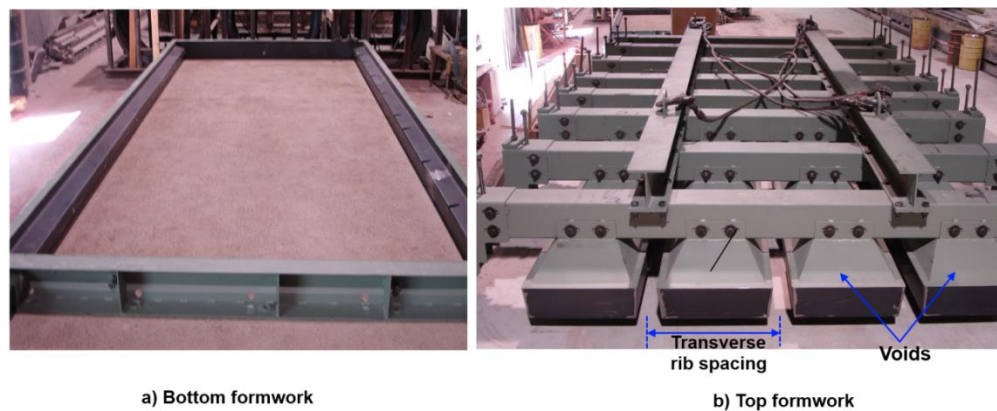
Formwork used for waffle deck panel construction at the precast plant
